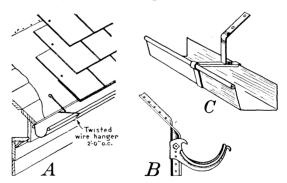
Hanging eaves trough: A, Circular section; B, adjustable hanger; C, rectangular section.
